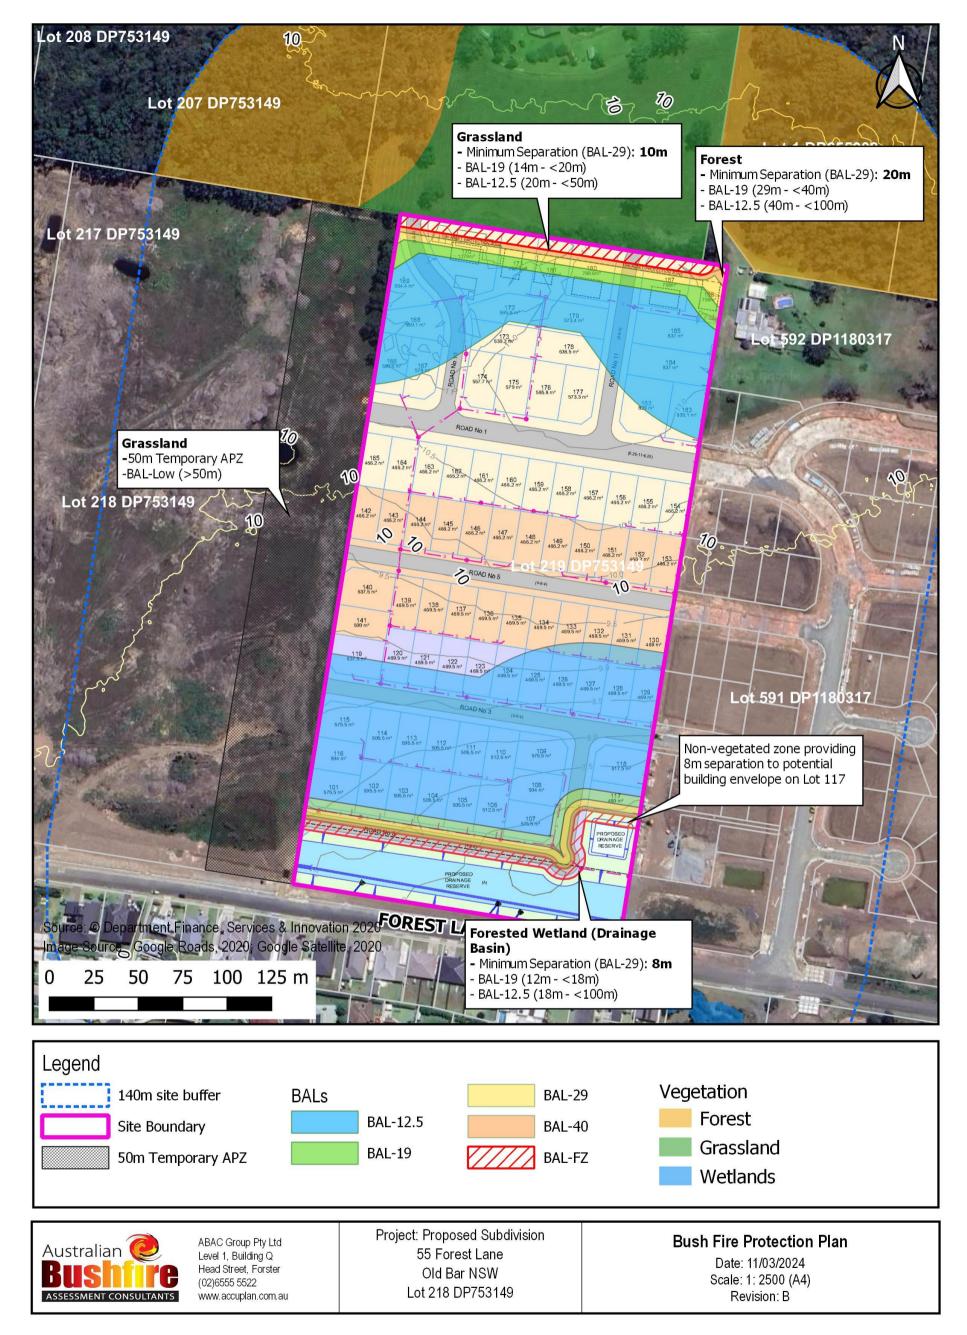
Bush Fire Protection Plan depicting proposed setbacks and Bushfire Attack Levels
